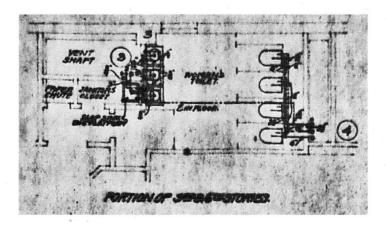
Typical restrooms on north end of third and fifth story of Parker building, north of elevators, Graham, Anderson, Probst, and White (Putnam Trust collection, unprocessed drawings).
